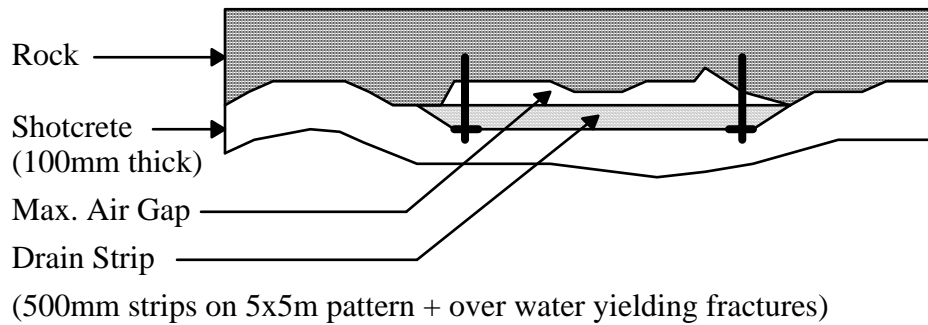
Detail of the Behind-Lining Shotcrete Drain Mat
